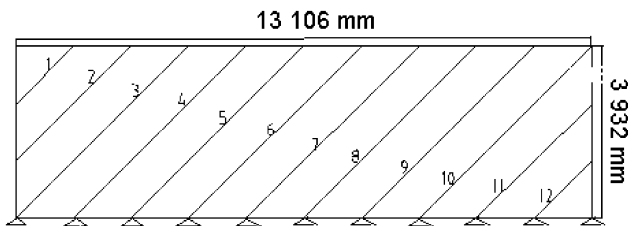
Twelve-strip model, beams pinned to columns, undeformed configuration.
